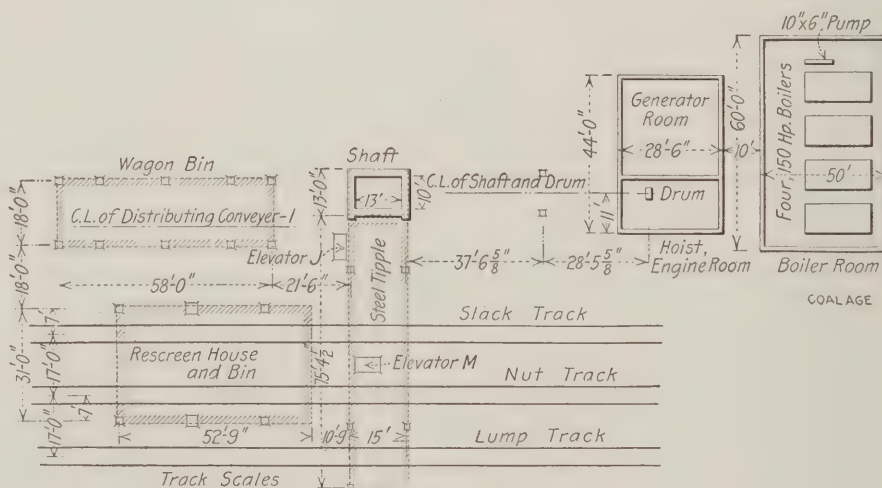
PLAN SHOWING SURFACE ARRANGEMENT OF PLANT
